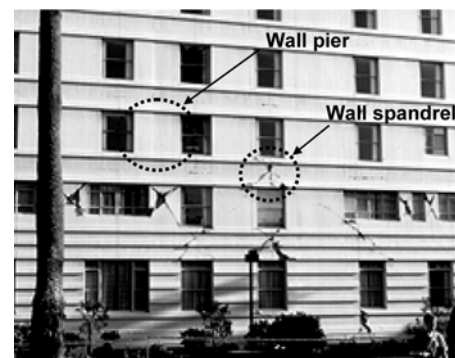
Wall piers and spandrels in a perimeter-wall building (Santa Monica, CA, 1994).
